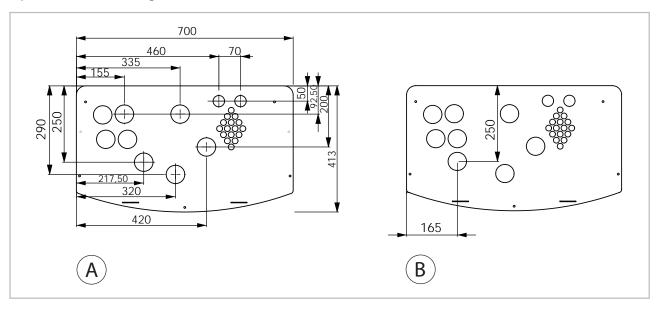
Pipe connection arrangement WKF 80-170 (All dimensions in mm)
